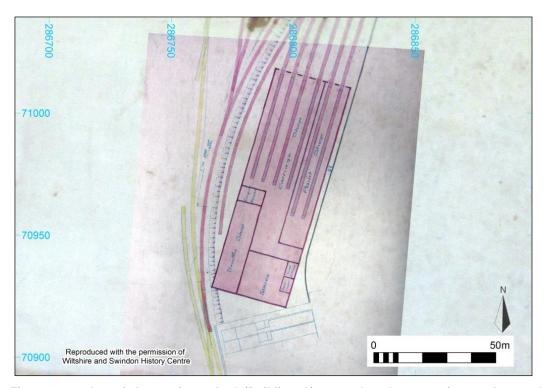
1892 plan of the carriage shed (Building A); note that the extension to the south (Building B) is not shown at this time.
